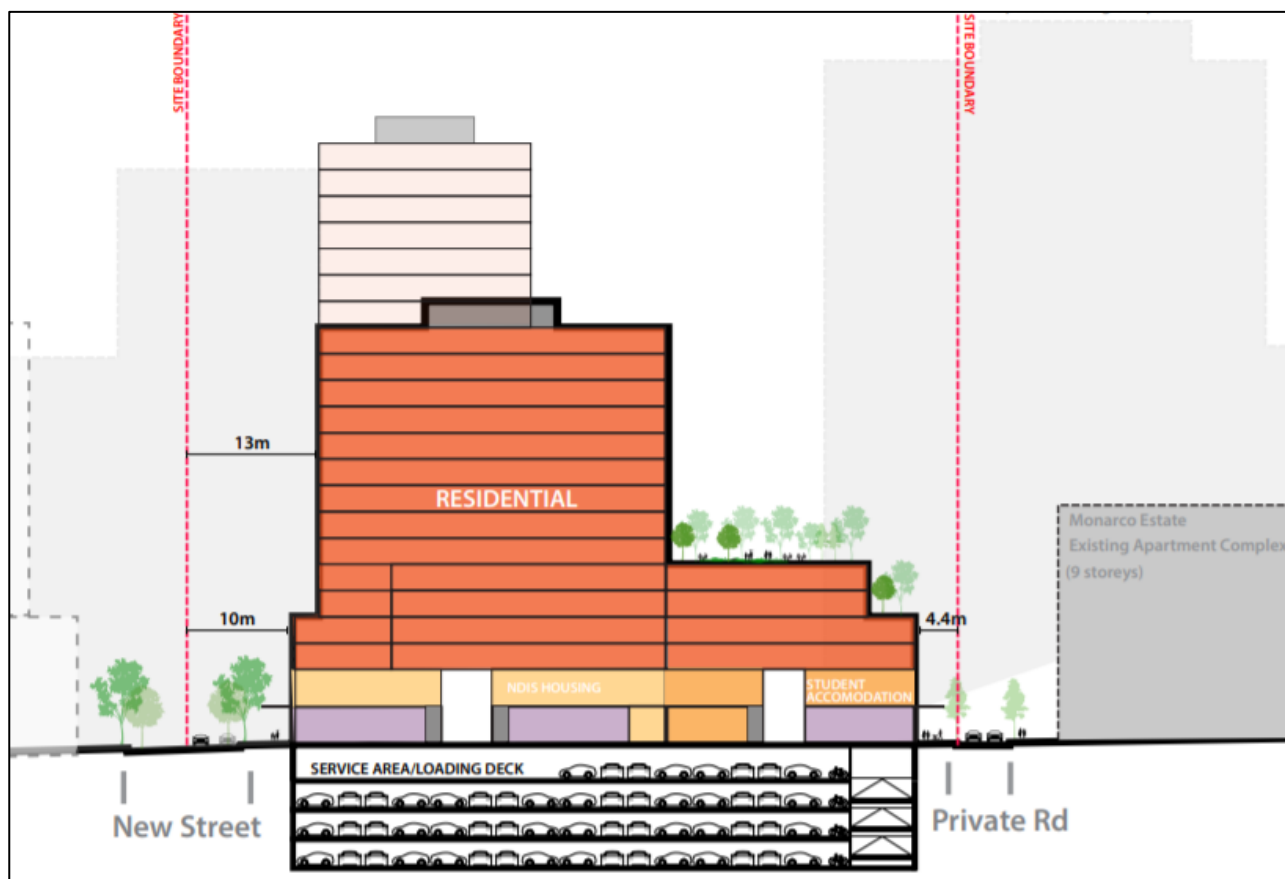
Base Case Height of Buildings for 93 Bridge Road, Westmead (Roberts Day 2020)
